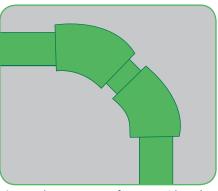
When trying to form a 90° bend, it is advisable to achieve the 90° bend by using 45° Elbows.
